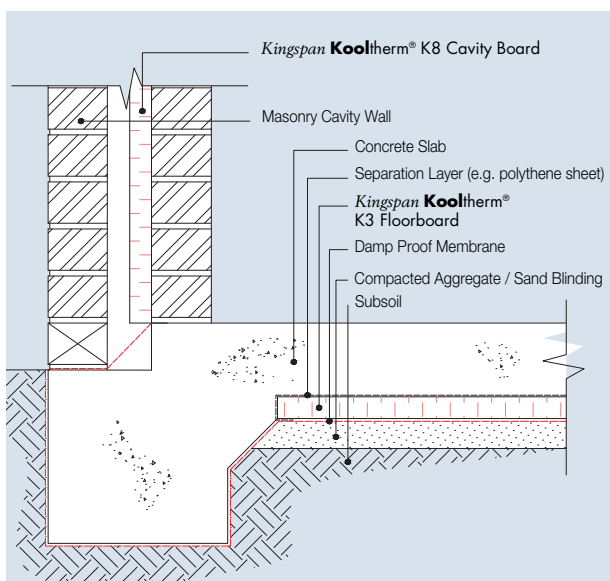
Side elevation - Cavity Wall on Ground Floor Slab with *Kingspan Kooltherm® K3 Floorboard
